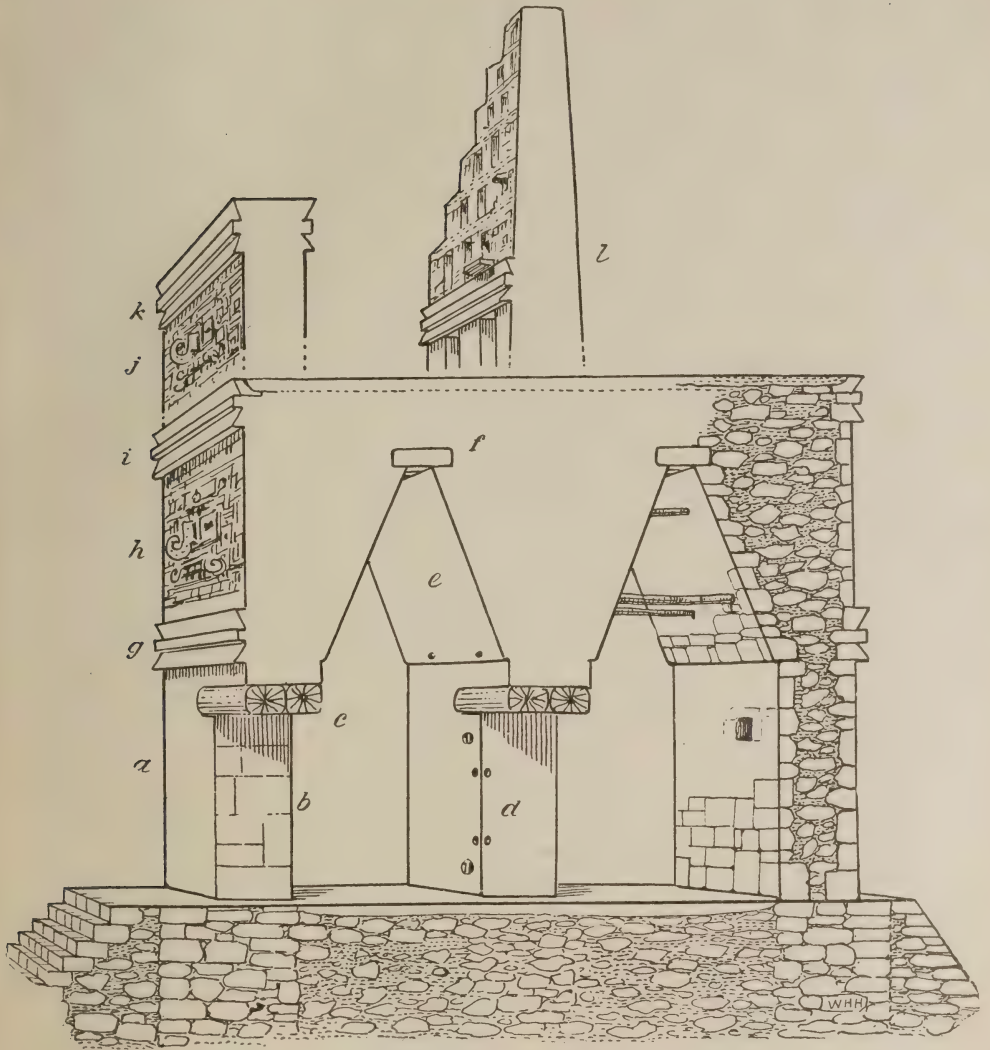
TRANSVERSE SECTION OF AN ORDINARY YUCATEC BUILDING.
